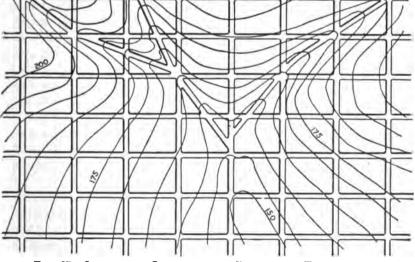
LAYOUT OF STREETS WITH REGARD TO TOPOGRAPHY.
